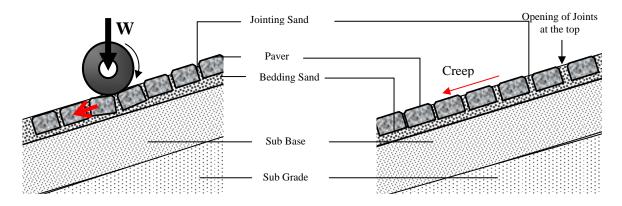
Deformation and horizontal creep of CBP for sloping road section
